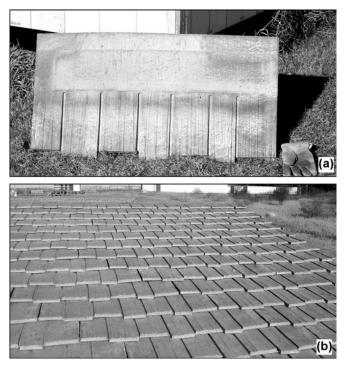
Components for WTPC structure: (a) roof tiles, (b) shingles.
